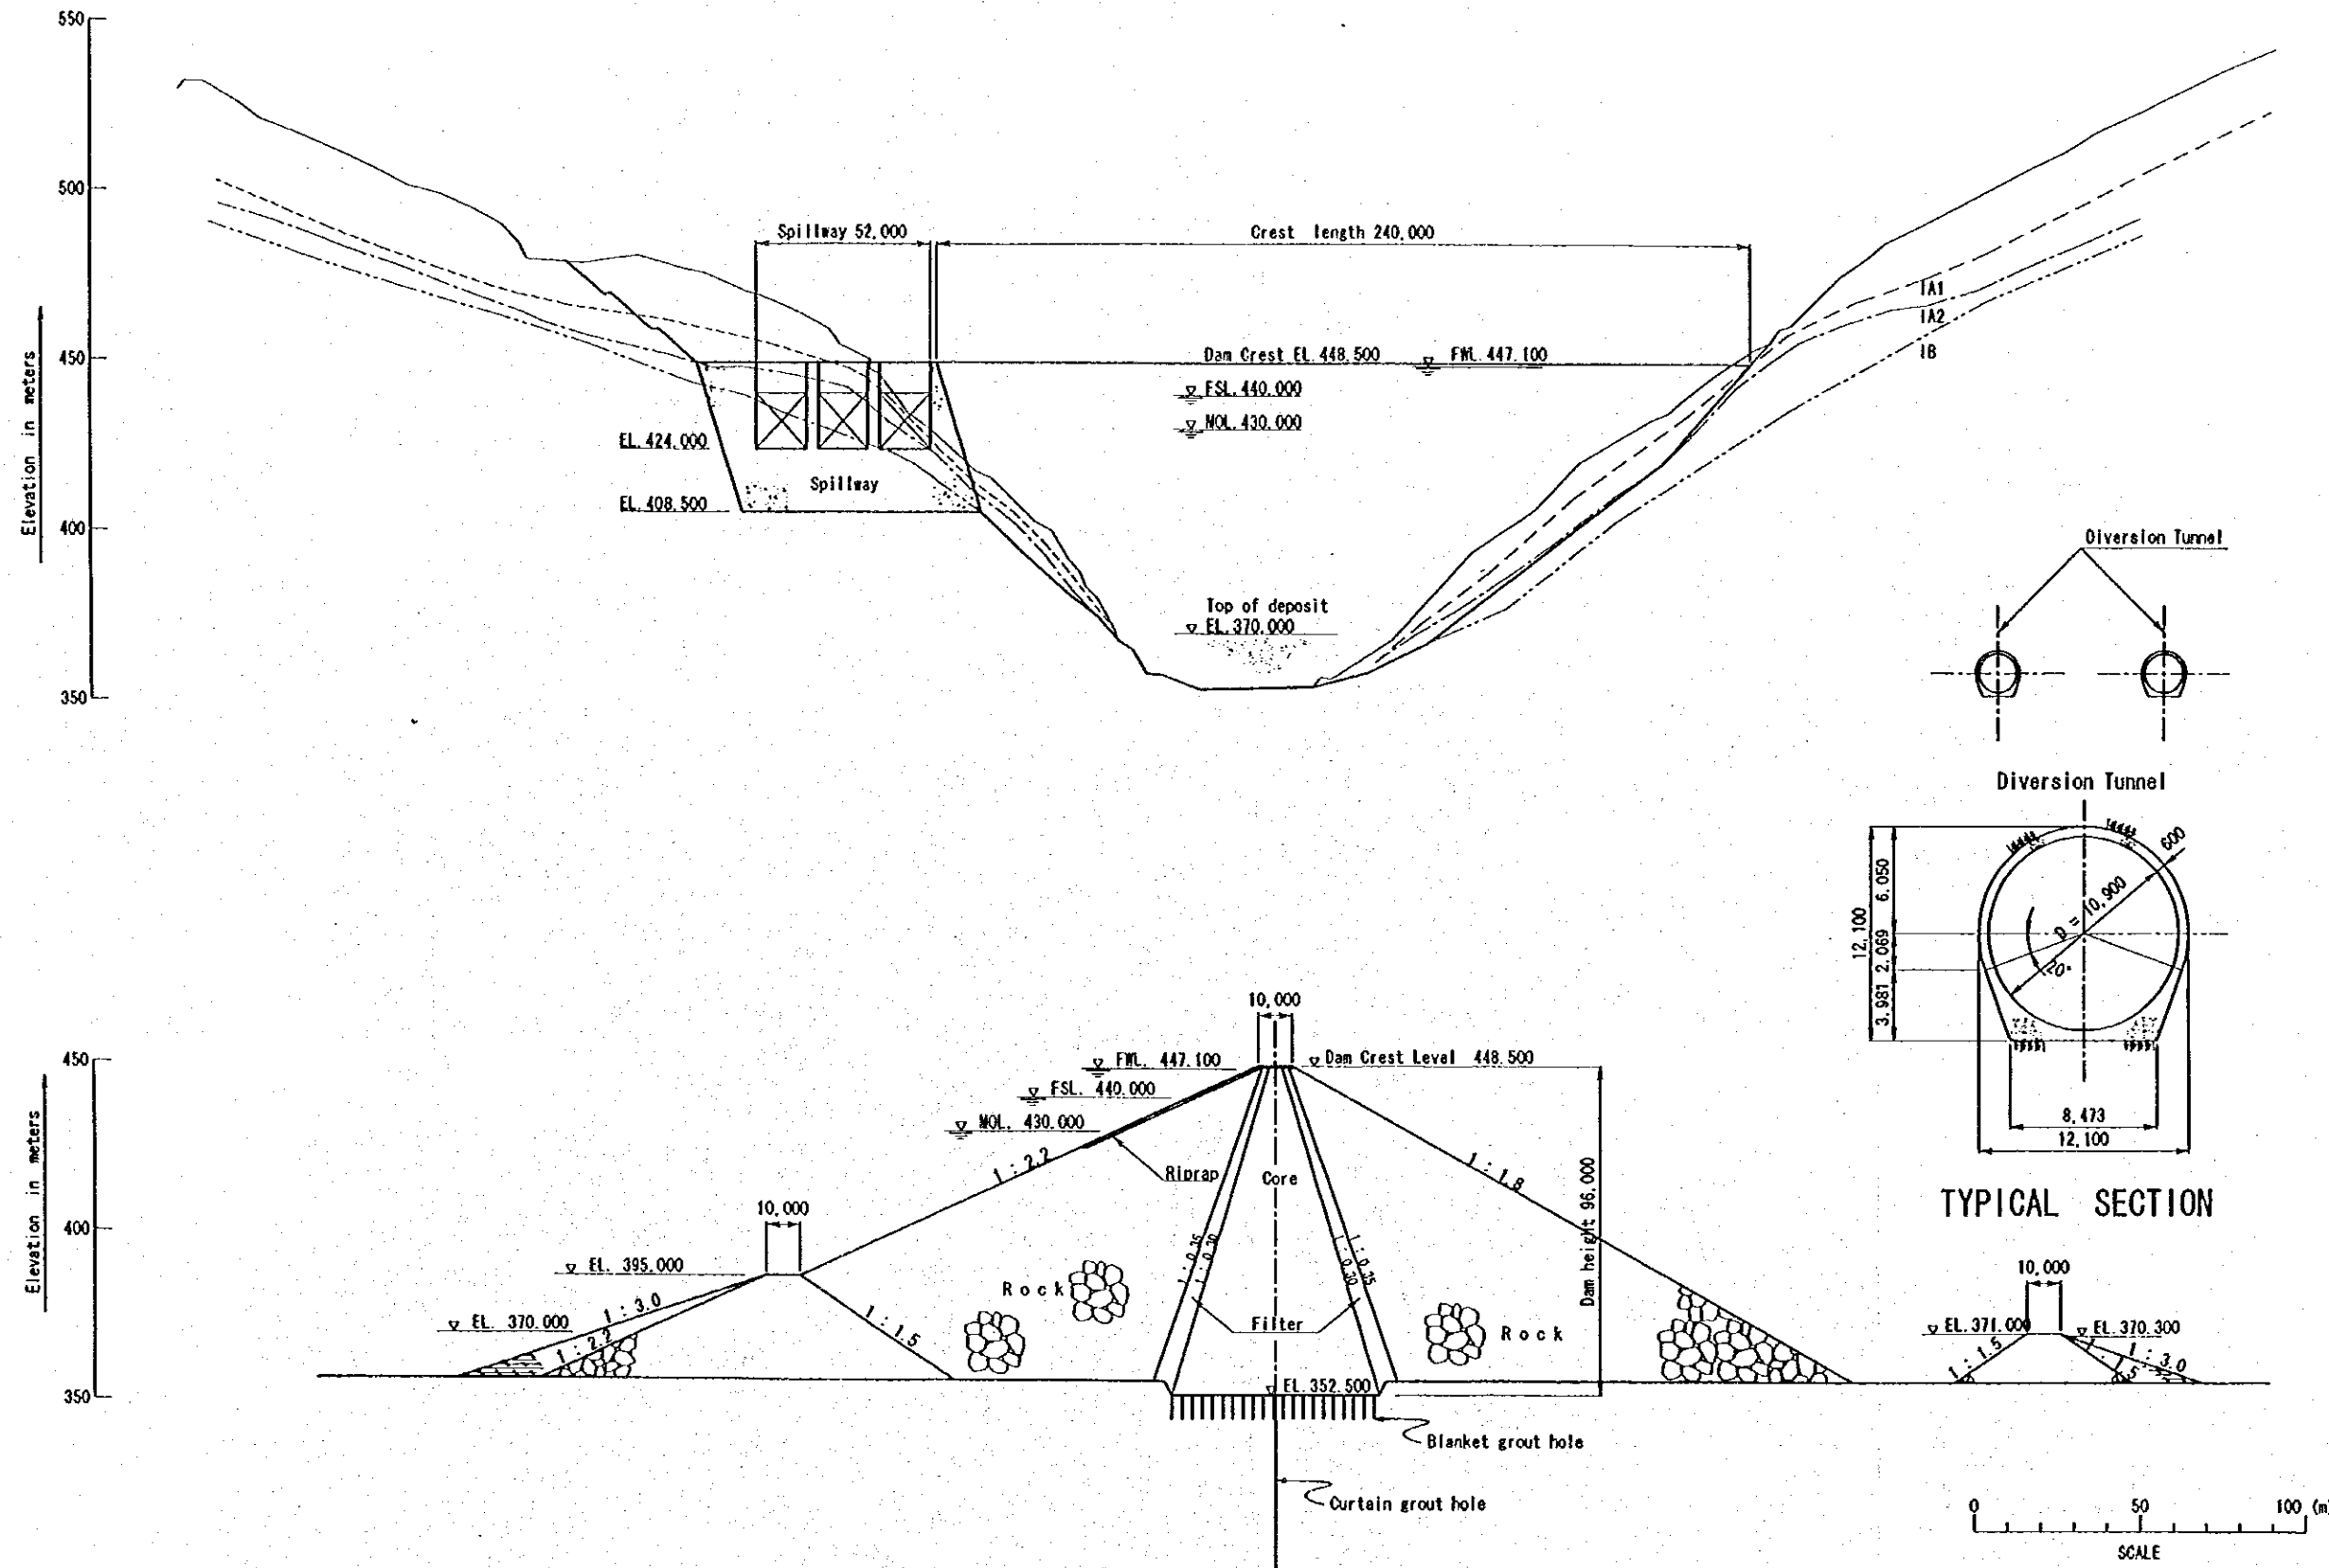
Typical Section and Profile of Dong Nai No.4 Dam
